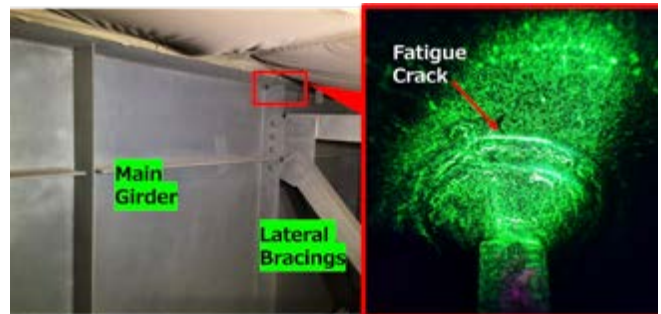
(c) Fatigue crack (main girders with lateral bracings)
